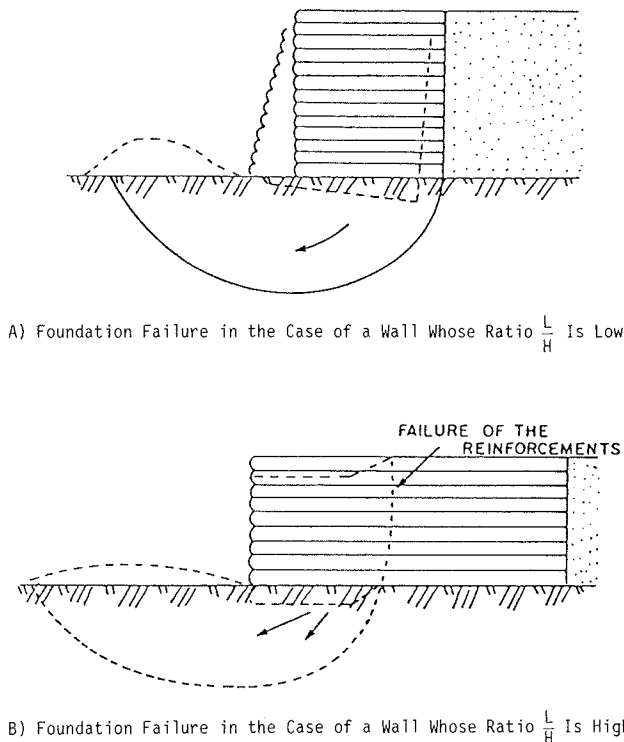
Modes of foundation failure under Reinforced Earth walls.
